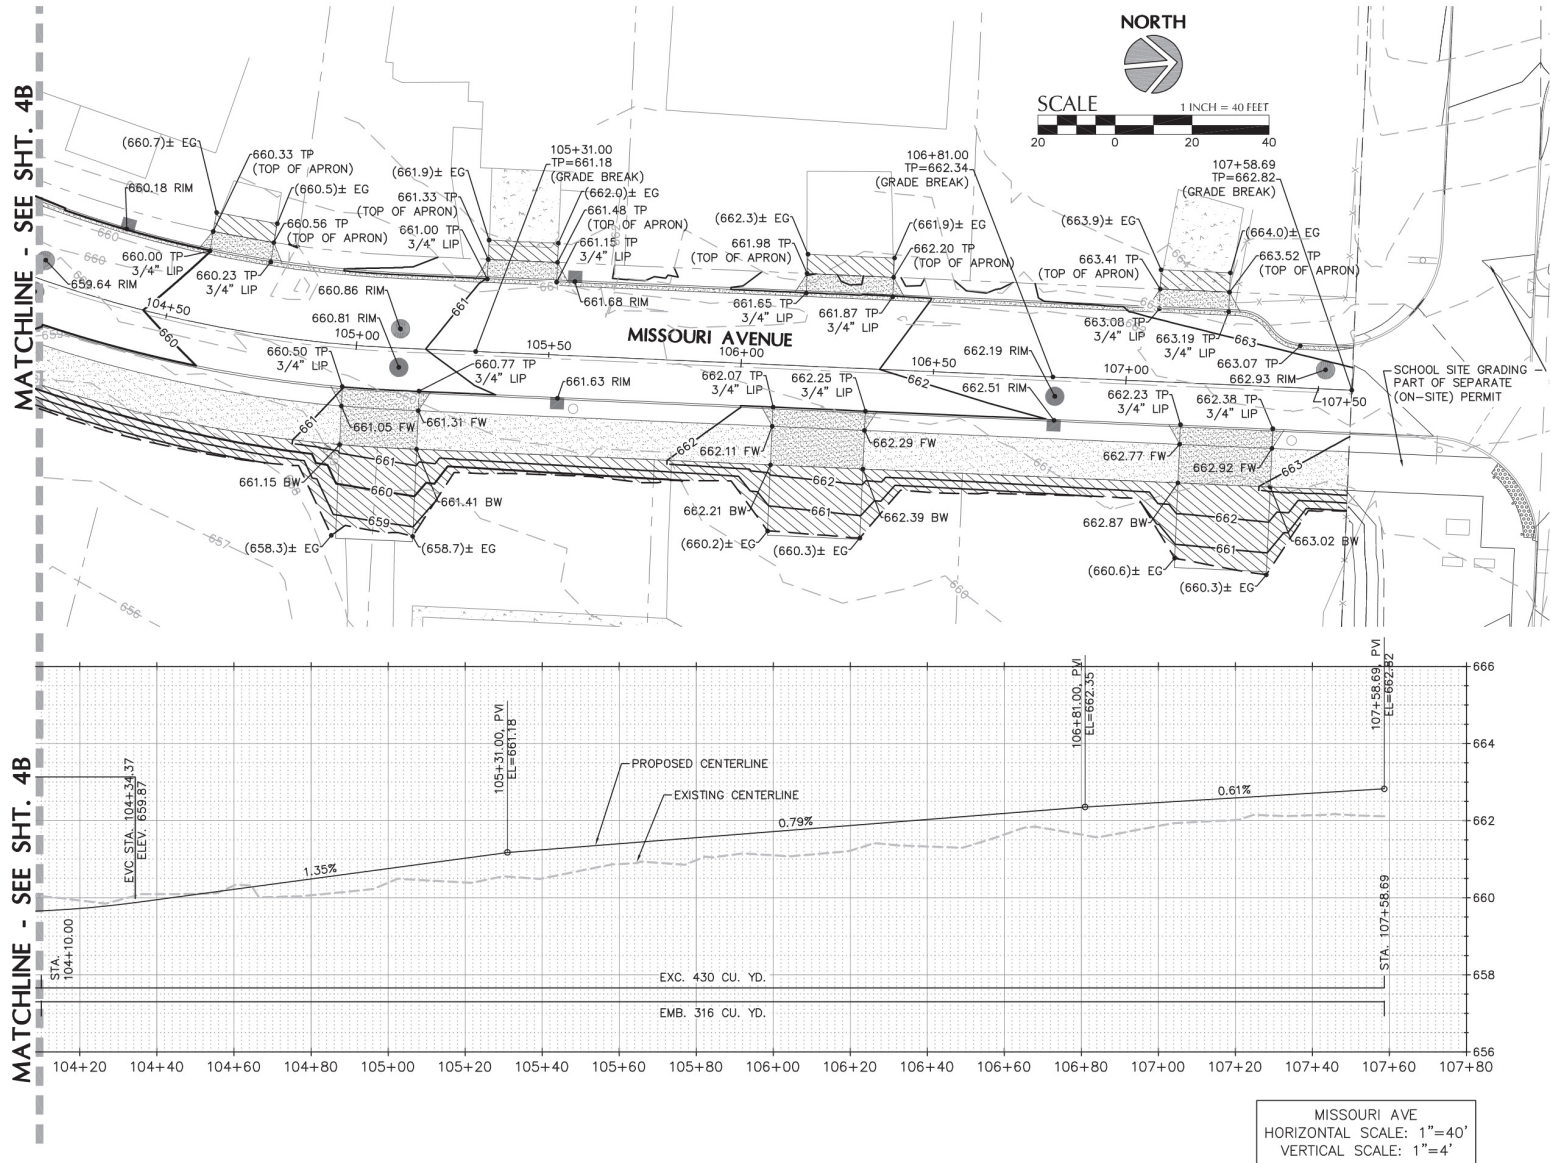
A grading plan and profile used to show existing and proposed topography.
